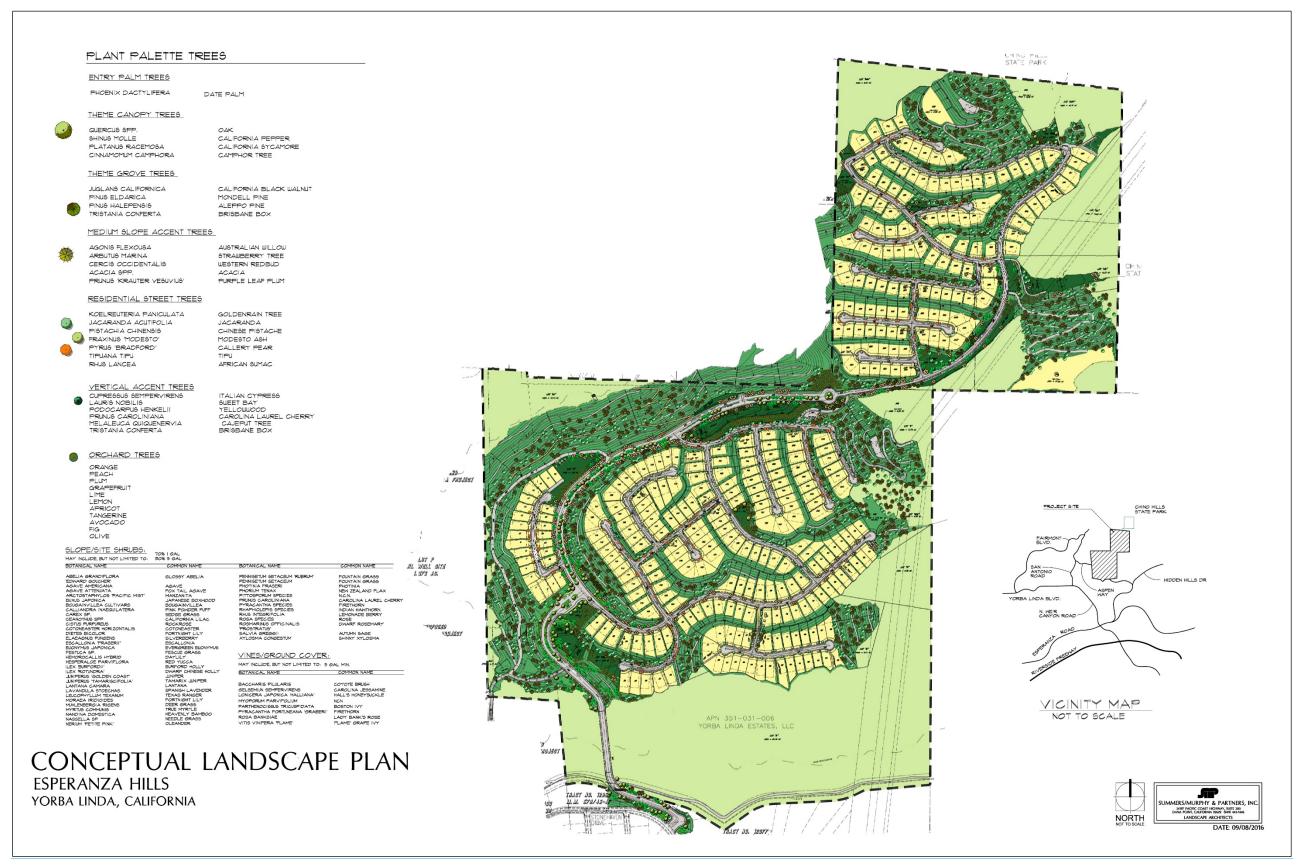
Exhibit 21 - Conceptual Landscape Plan, San Antonio Road Access Configuration
